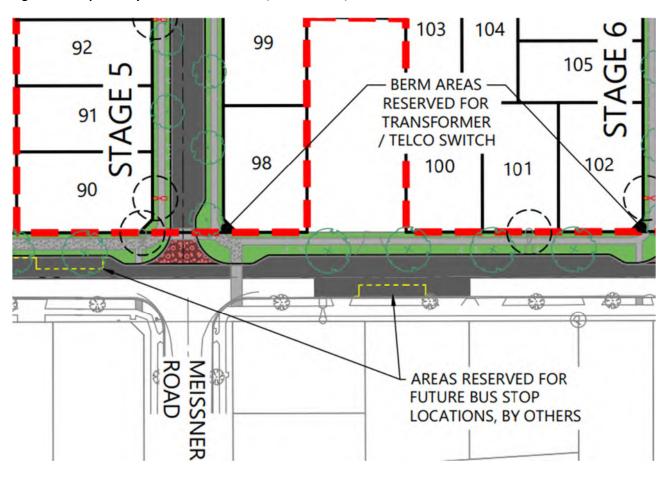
Proposed layout of Meissener Road/Arataki Road/Access Road AR04 intersection
